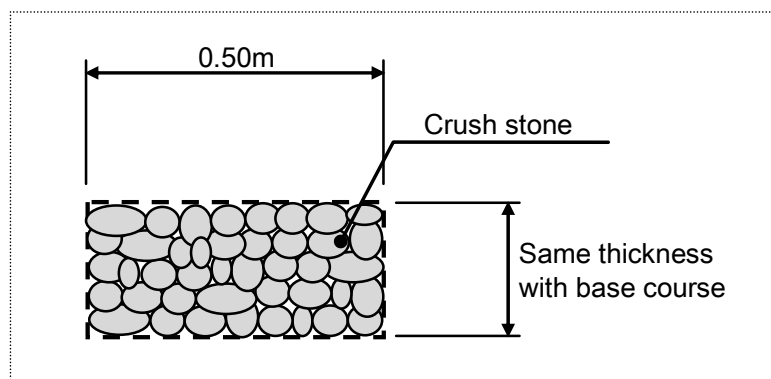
Dimension of Drainage Layer (Not to Scale)
